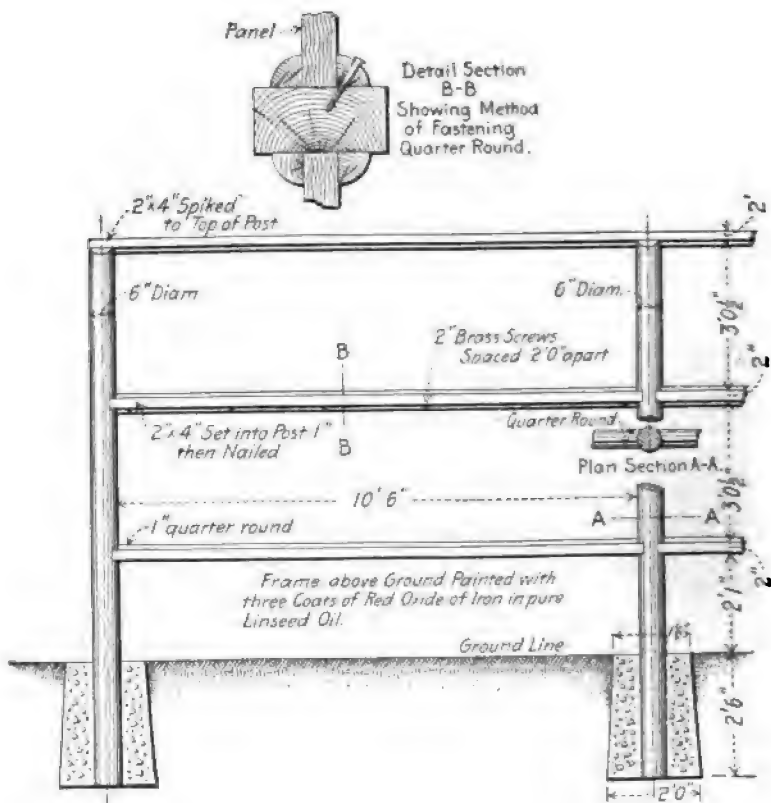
Showing Construction of Frame and Mounting of Test Pieces.
